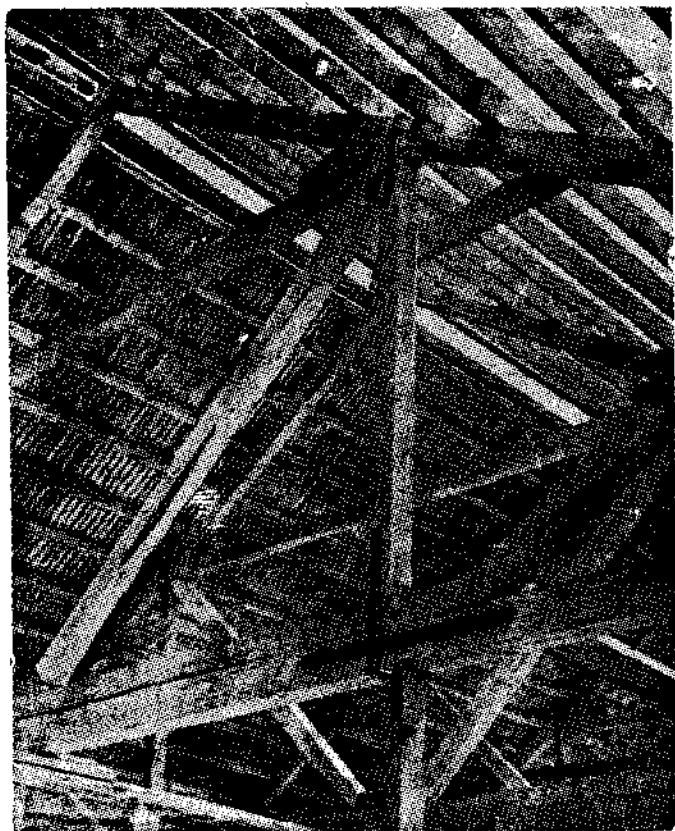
Timber Roof Truss showing Main Tie-beam, Diagonal and Vertical Struct.
